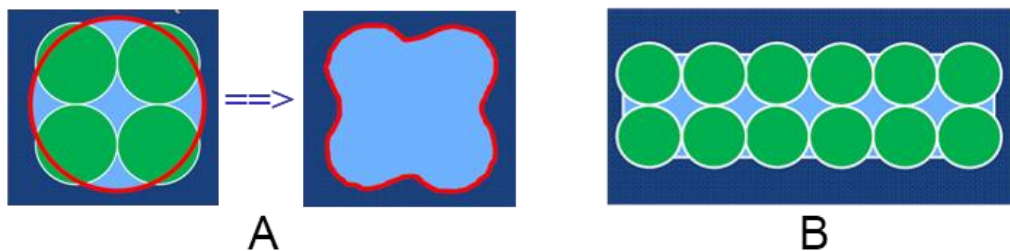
Four piles replacing a single pile and twelve piles replacing a barrette
